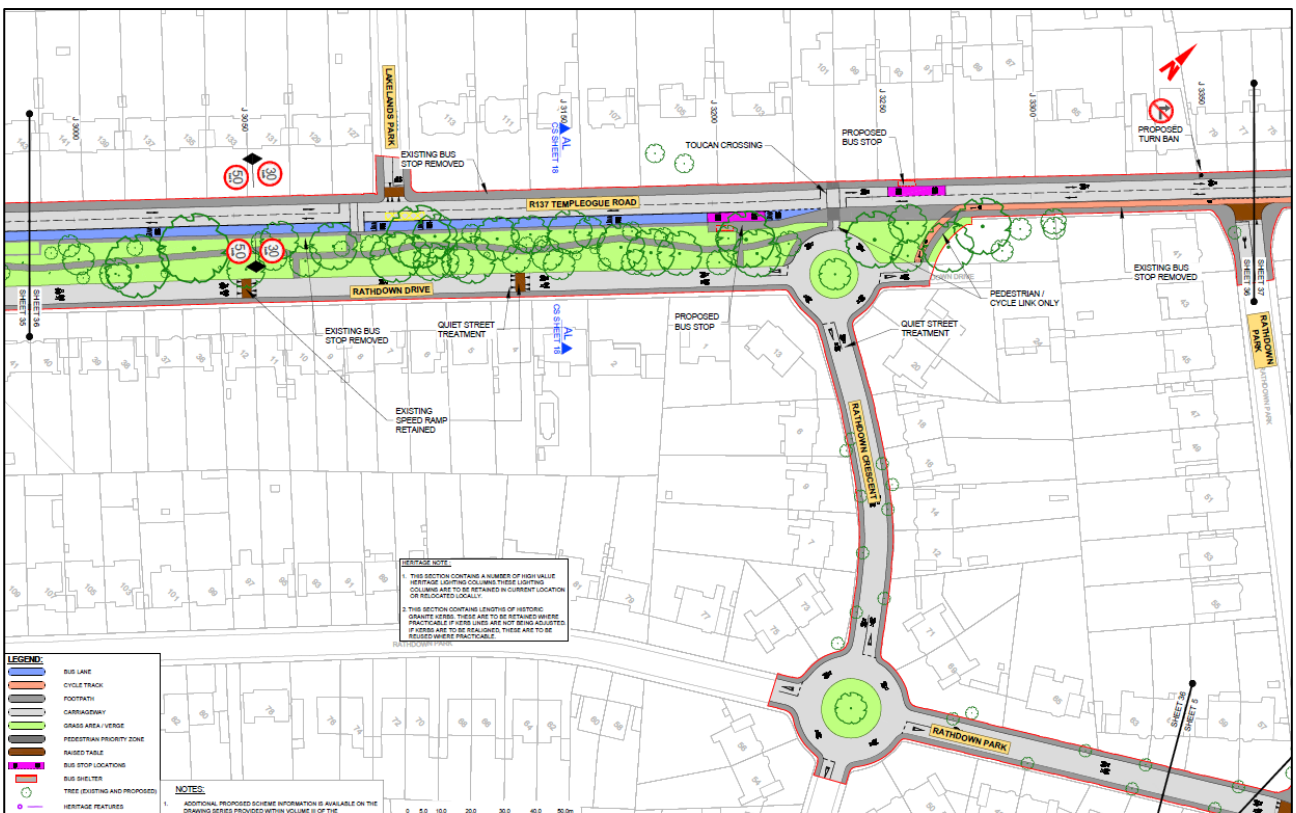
Extract from General Arrangement Drawings (Sheet 36)
